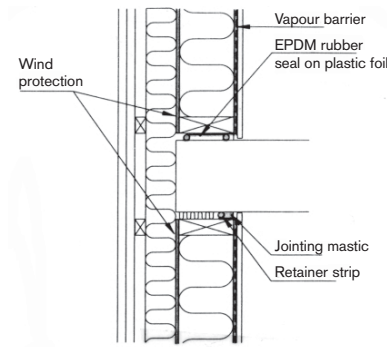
Vertical section through the junction of an external prefabricated timber wall element and an intermediate concrete floor. A sealing strip of EPDM rubber is placed on the upper side, and jointing mastic and a retainer strip are used underneath the concrete floor.
